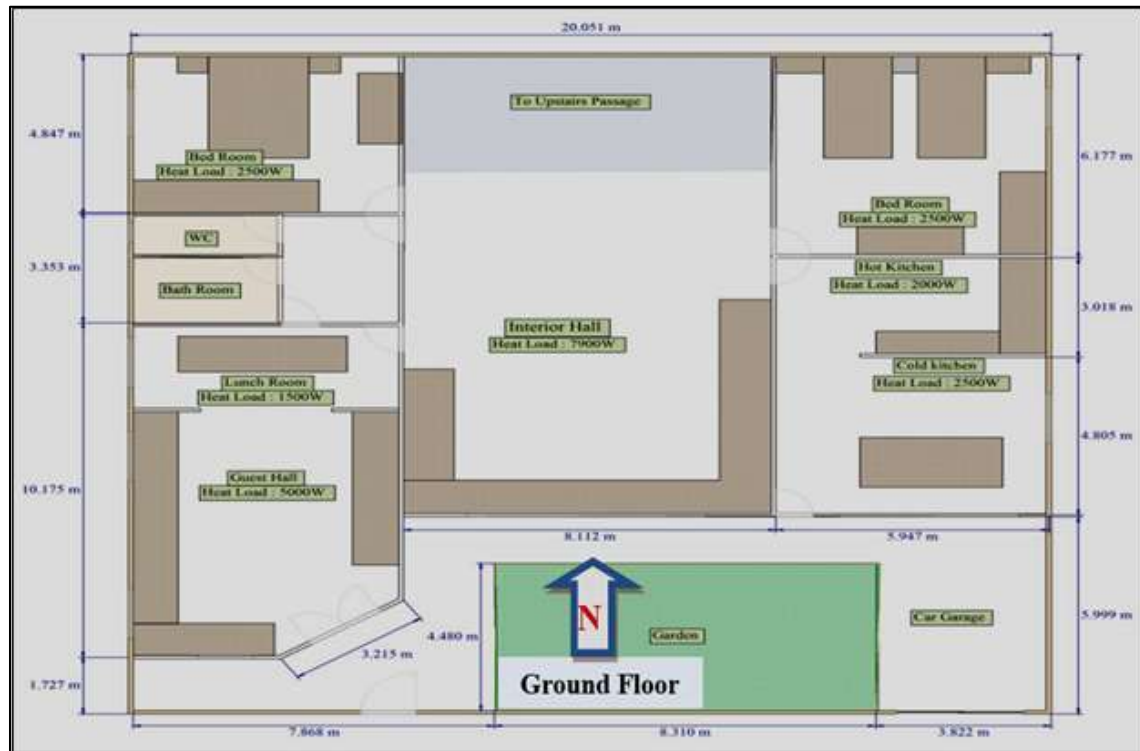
a: Details of Architectural Plan and Heating Load Values for Ground Floor of Villa
